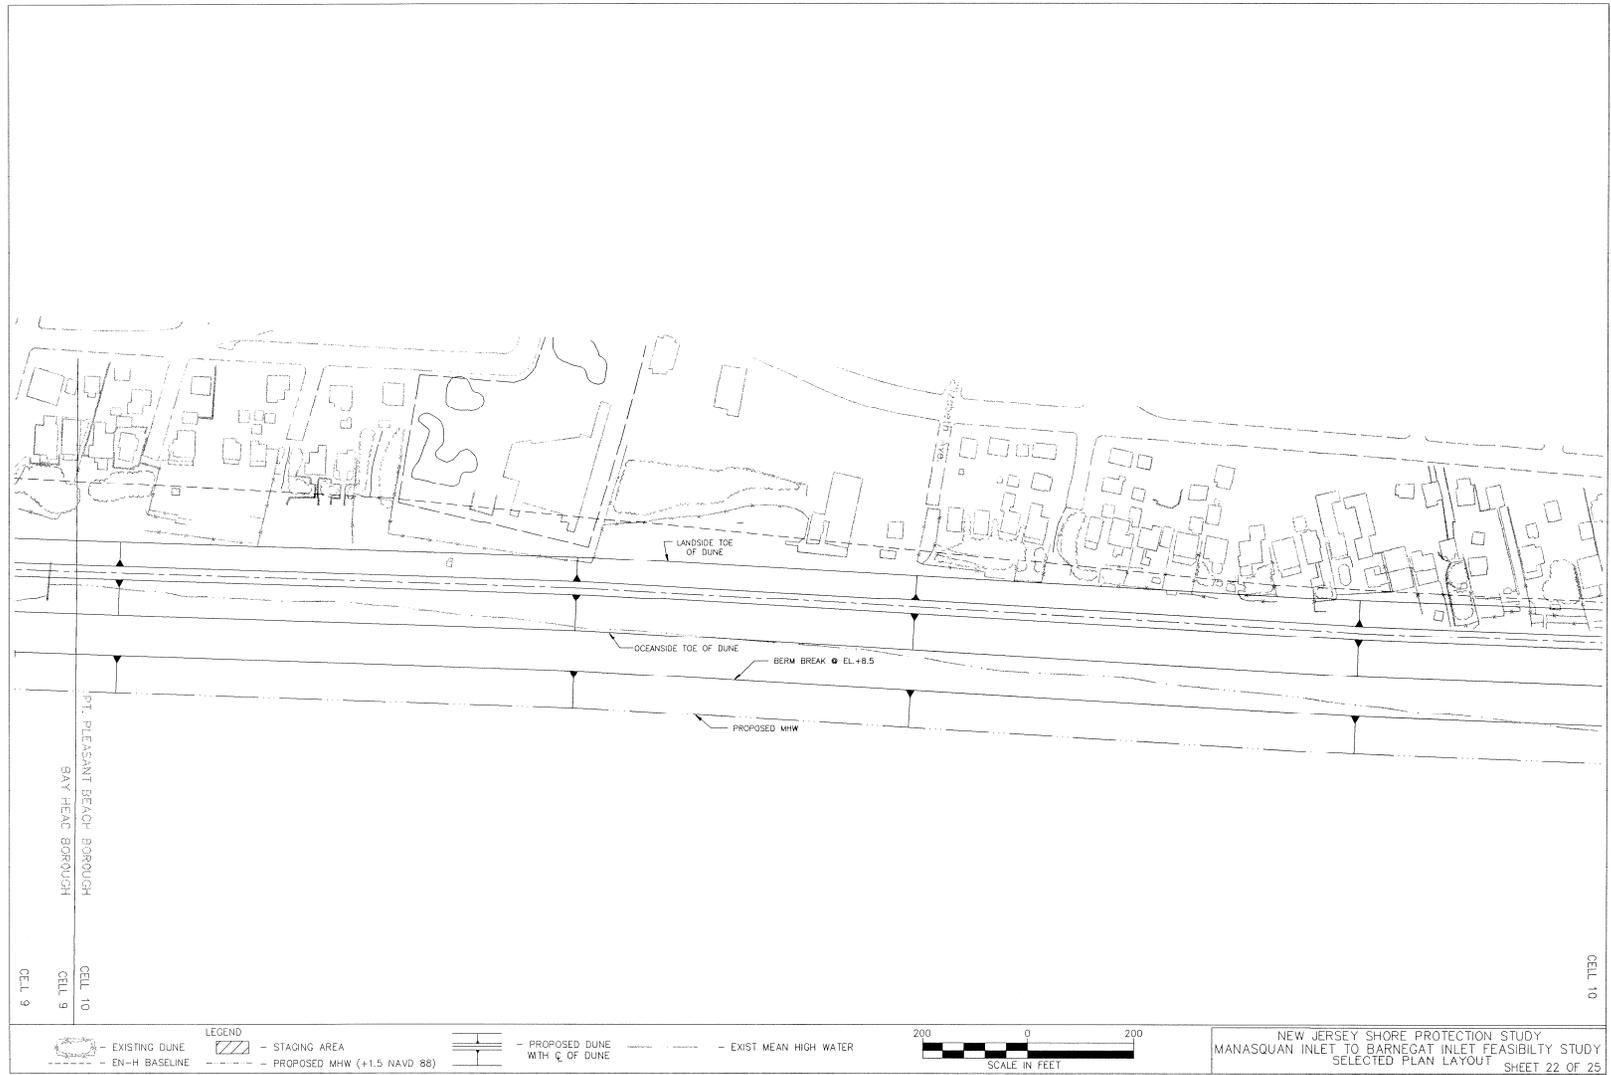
Selected Plan Layout – Point Pleasant Beach Borough
